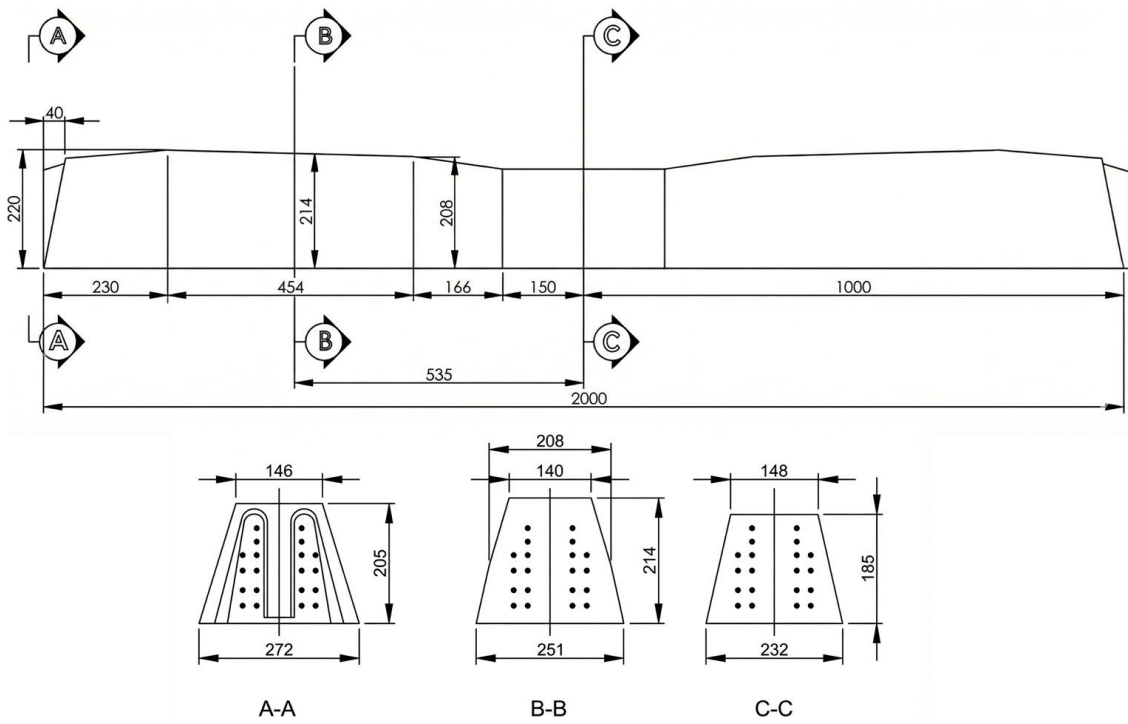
Dimensions of prestressed concrete sleeper specimens.
